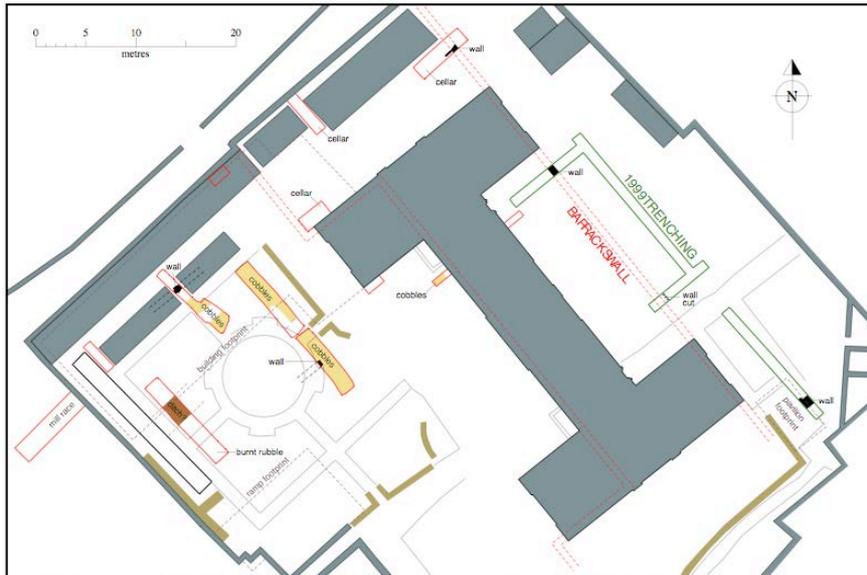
Site plan, showing 1700s Barracks outline, existing Evans Home, 1999 and 2010 trenches, and new build footprint.
